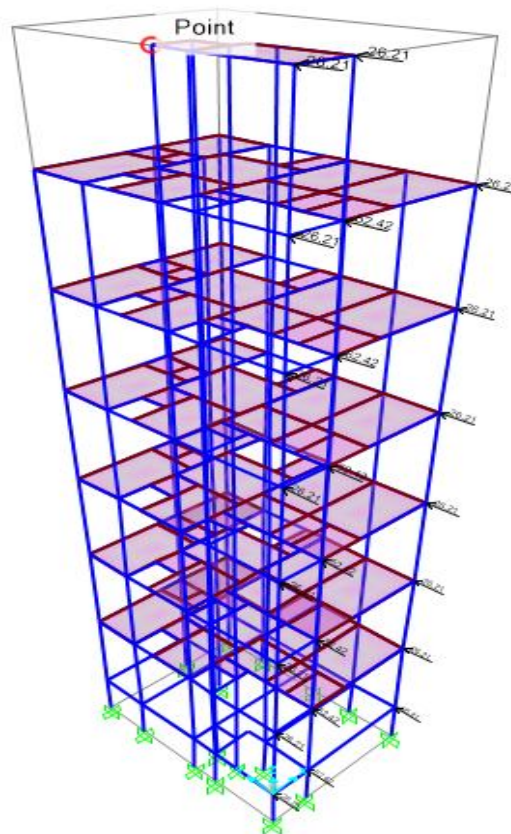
100 kg TNT blast load applied at front face of building as joint load at 30m stand-off distance (Without shear wall)
